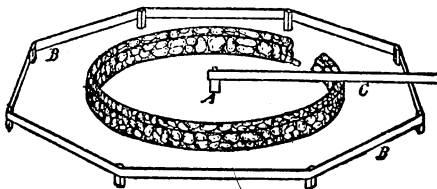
Method of laying and leveling the foundation of a round silo.
